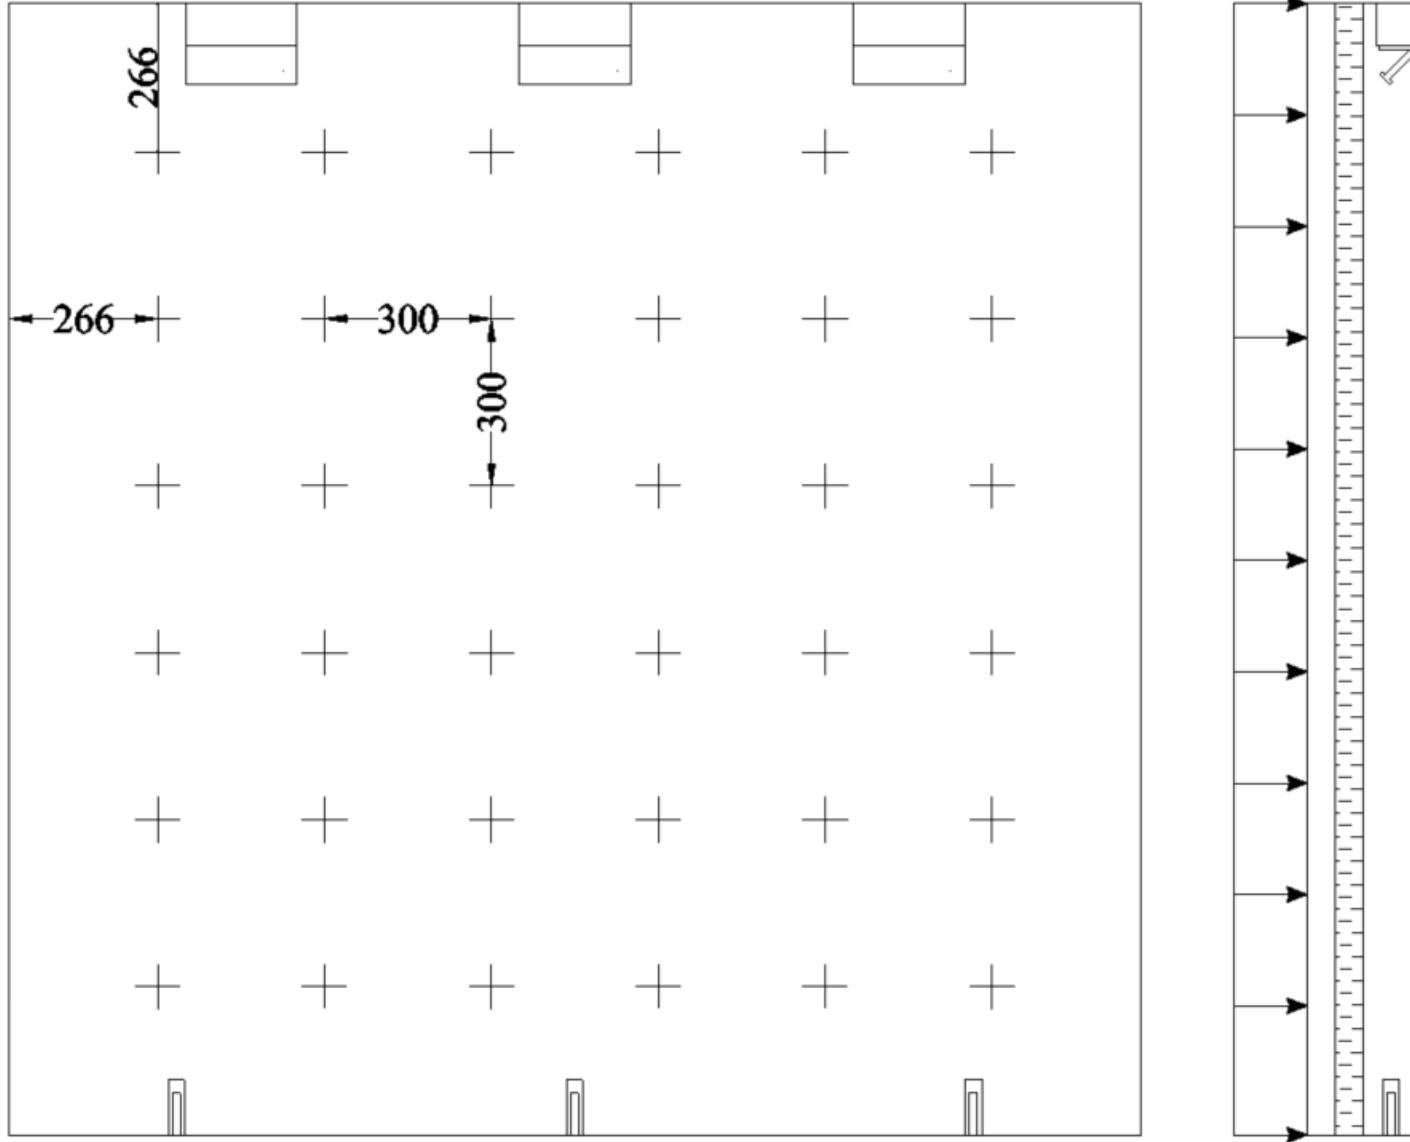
Typical Shear Tie Locations for Sandwich Panels
